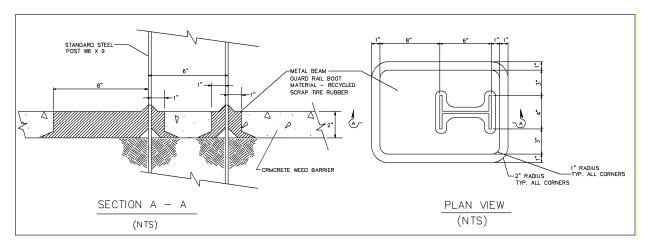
CRMCrete Boot Details for Tests 654 and 655
